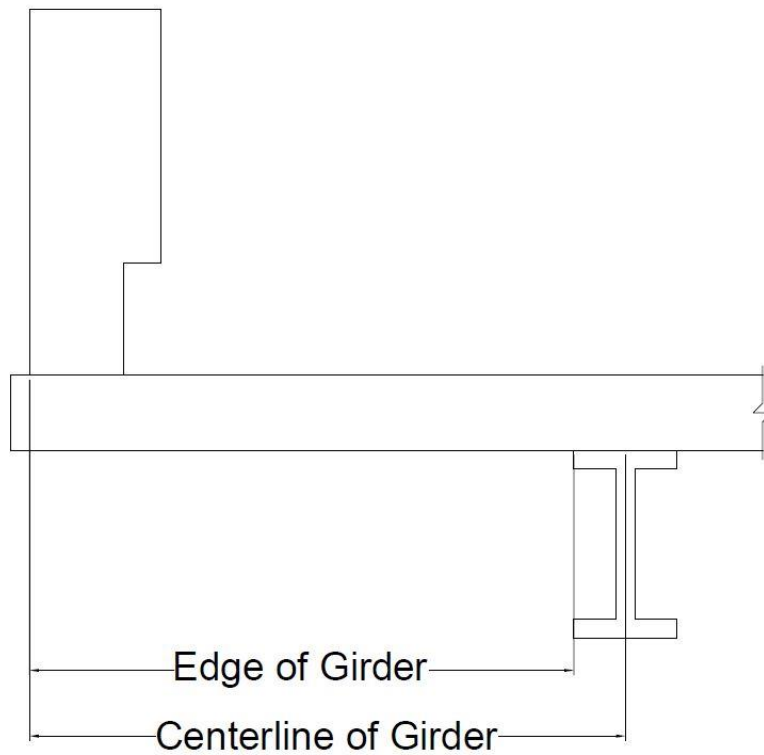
Rear of Post to Edge of Girder and Centerline of Girder
